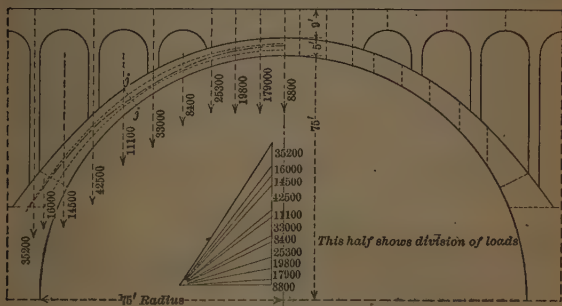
Connecticut Ave. Arch, Washington, D. C.
